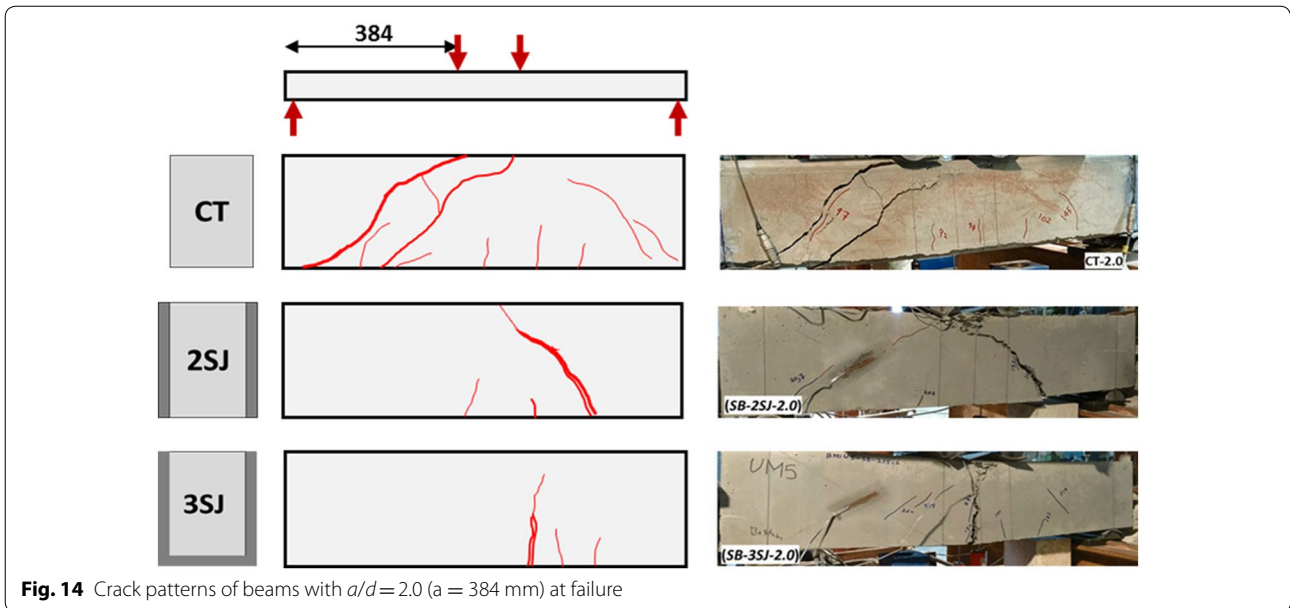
Crack patterns of beams with $a/d = 2.0$ ($a = 384$ mm) at failure
